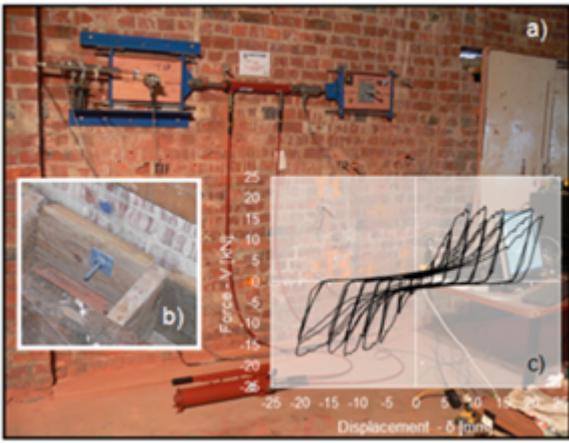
New shear transferring anchoring system: a) anchor test setup; b) new anchor installation; c) cyclic test results
